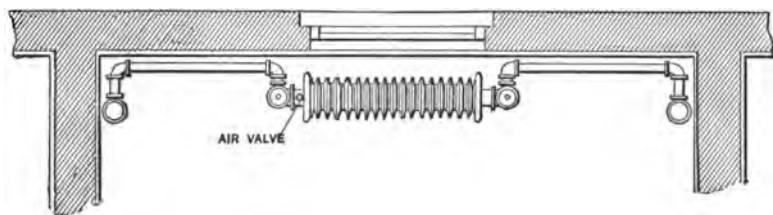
Plan, Two-Pipe Radiator Connections Above Floor
